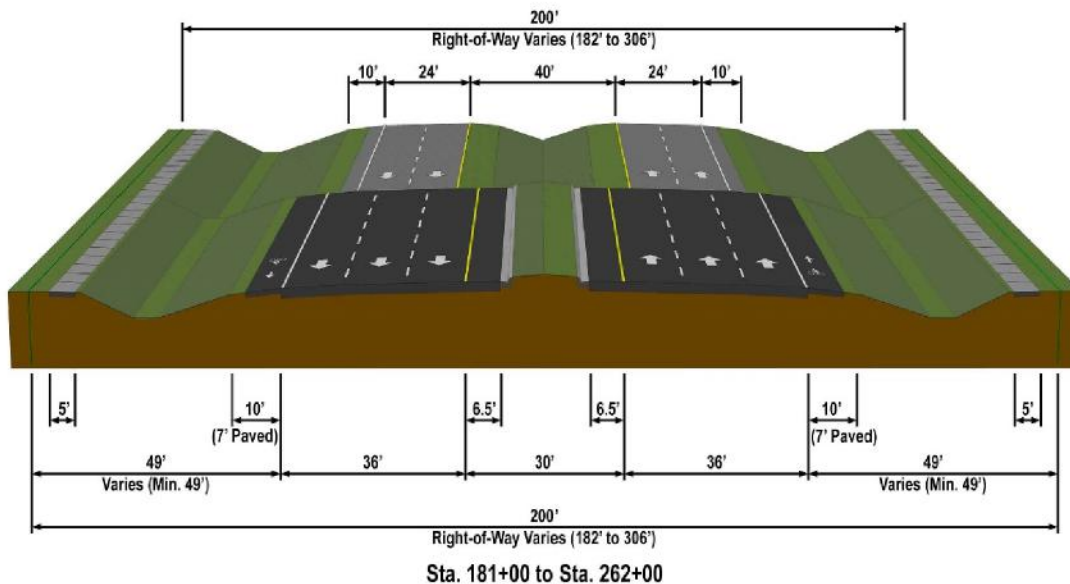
Suburban Typical Section – Alternatives 1 and 2
